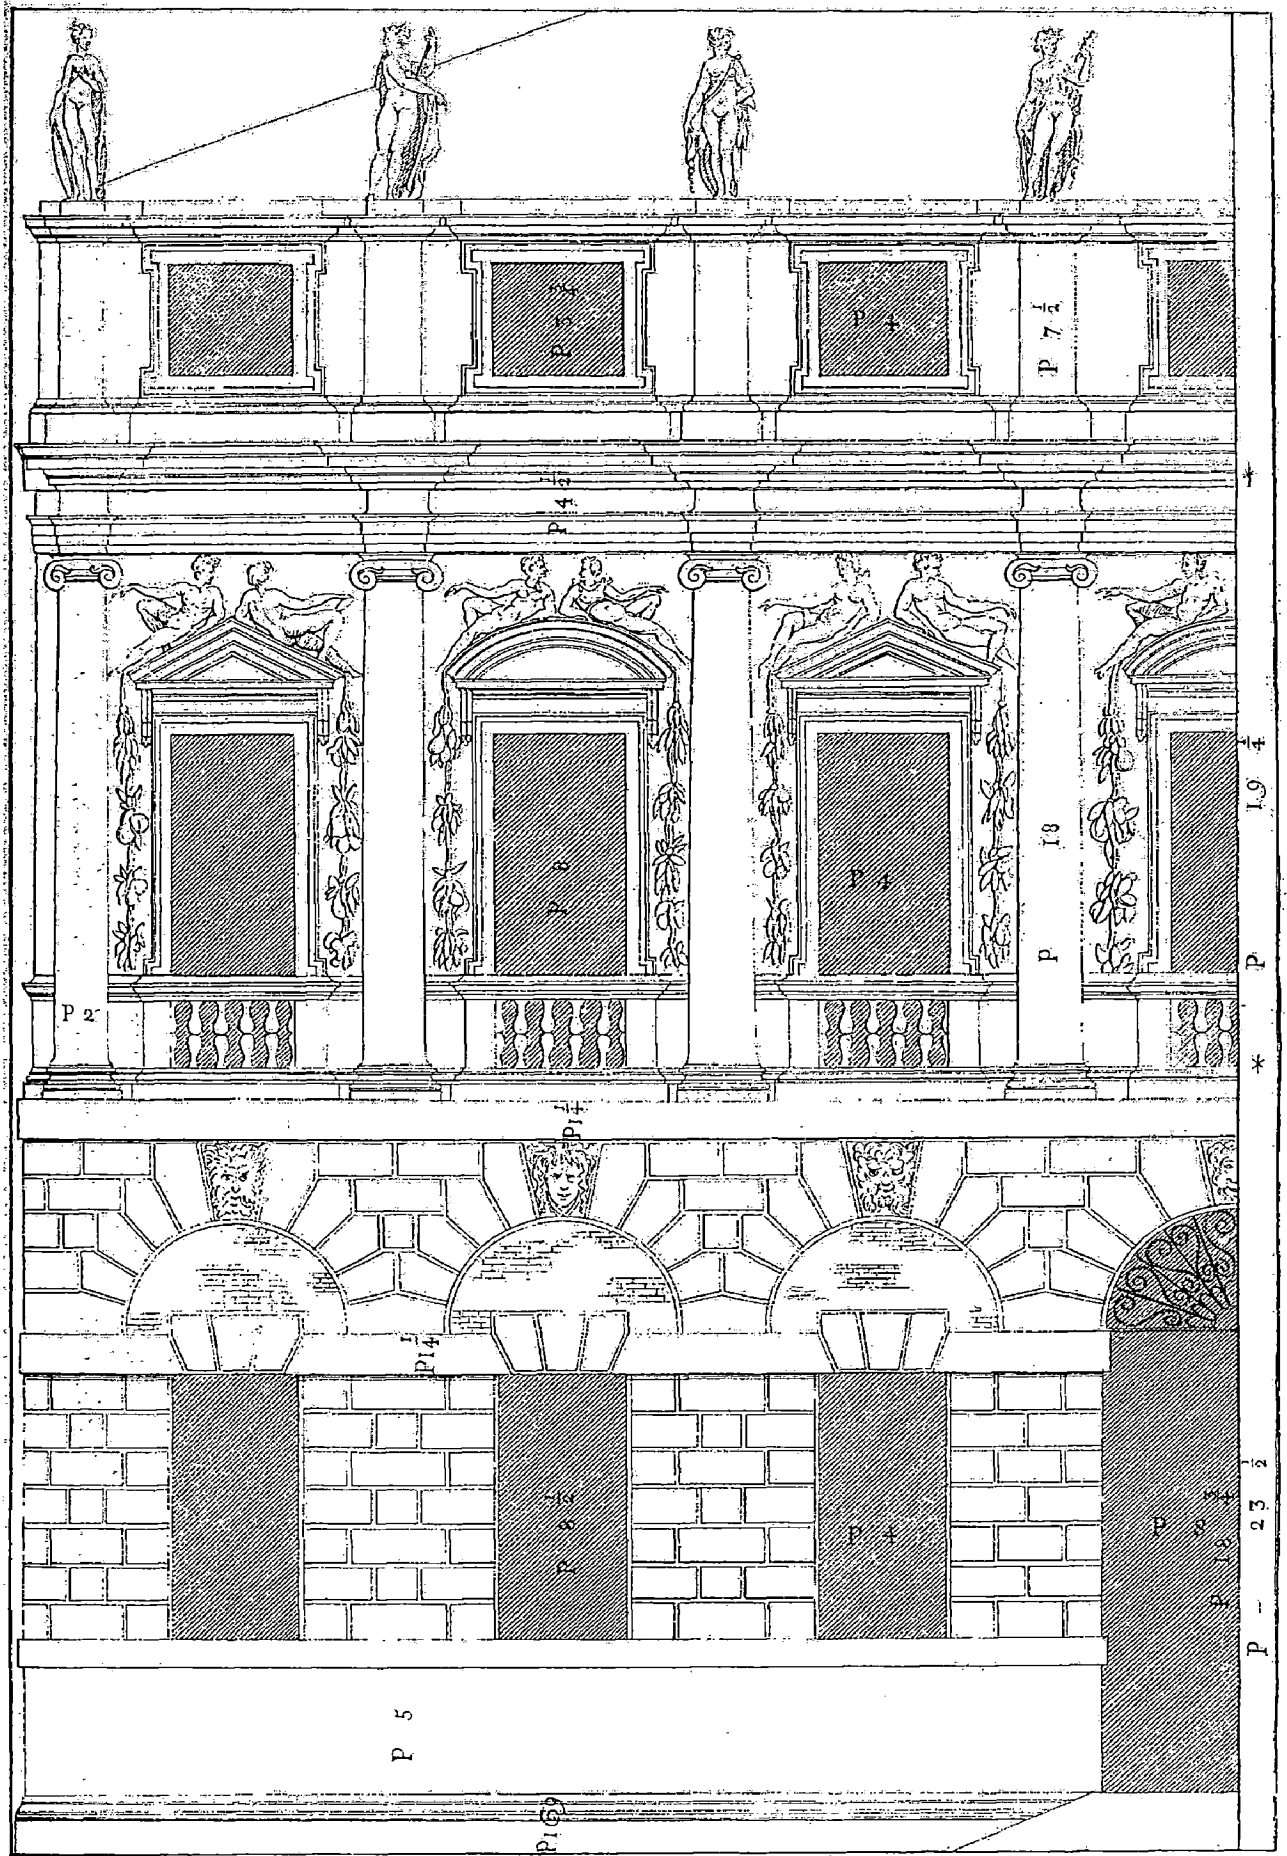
Palazzo Iseppo de' Porti at Vicenza Half of the main elevation
